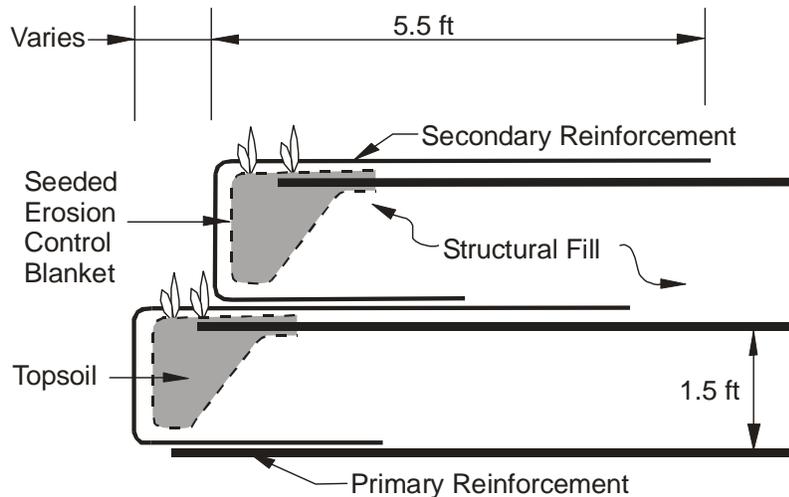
Flexible Facing Used with Reinforced Soil Slope Cover System for a Hazardous Waste Landfill (modified from Cargill and Olen, 1997; 1998).
